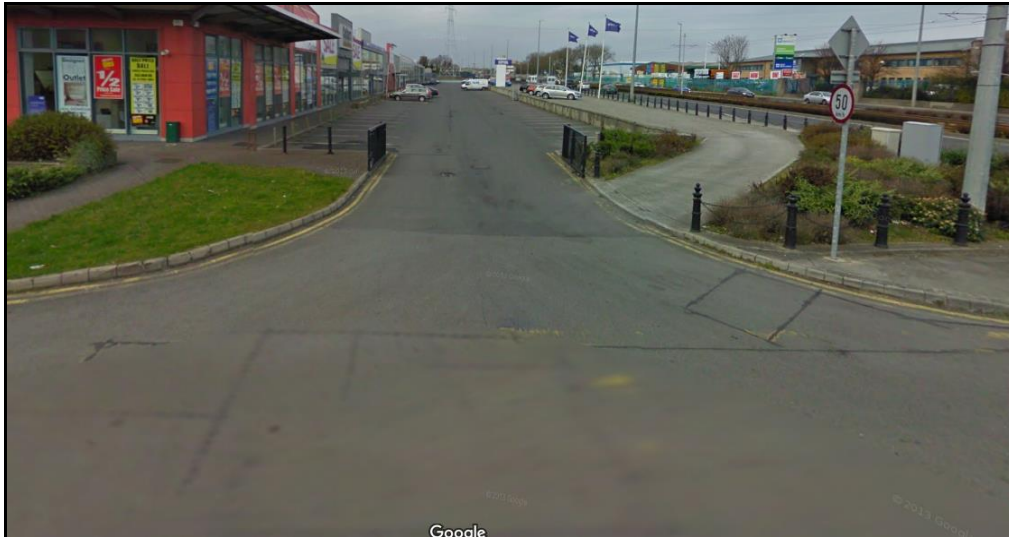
Existing Site Access onto the Un-named Road Retained During Construction
